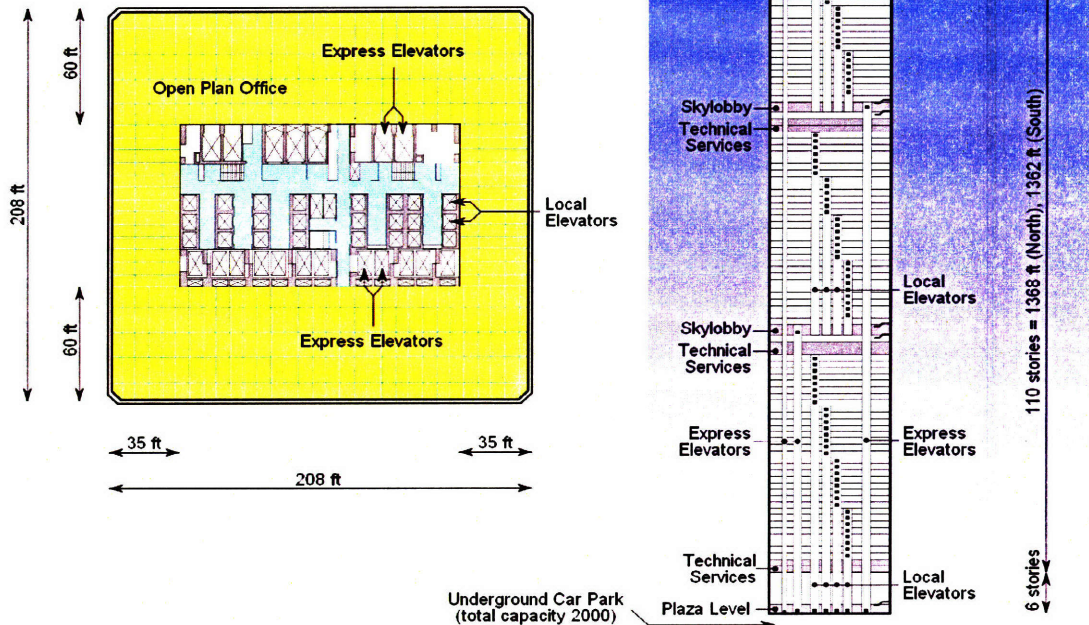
A common skyscraper floor plan (Wikipedia, 2008)
